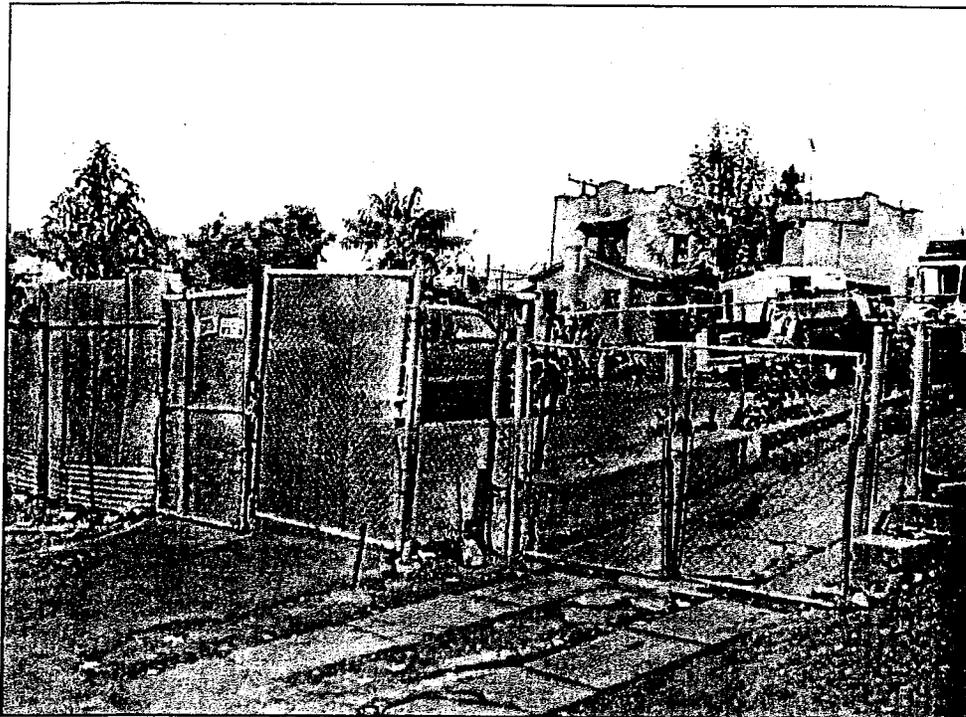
No sidewalks, curbs or gutters at 1521 N. Bonnie Beach
